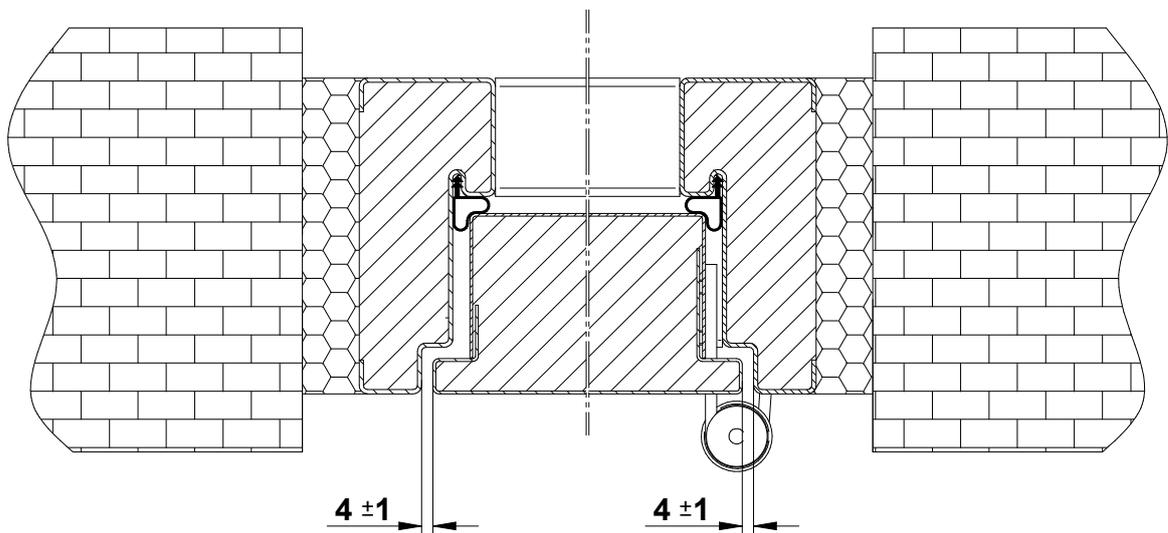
Gap tolerances between the door leaf and the frame
